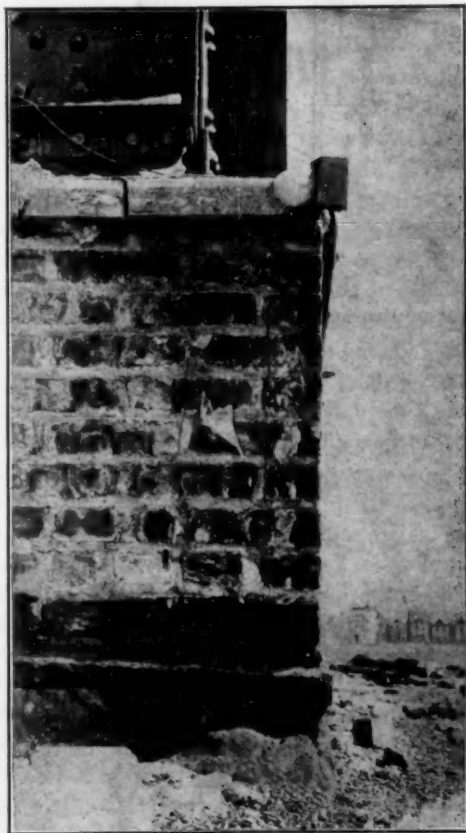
VIEW OF SUPPORTING WALL THAT HAS CRACKED UNDER WEIGHT OF
